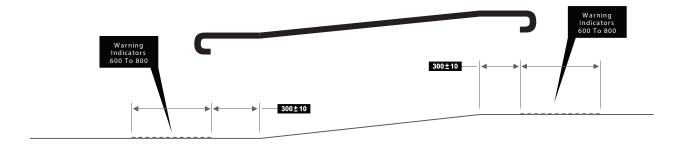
C: Warning Indicators - Ramps. Side elevation where top andbottom of ramp leads to an open area
